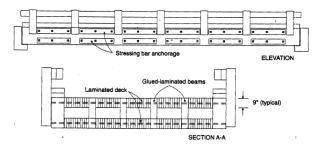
Typical details for stress laminated timber box beam bridge decks [7]
